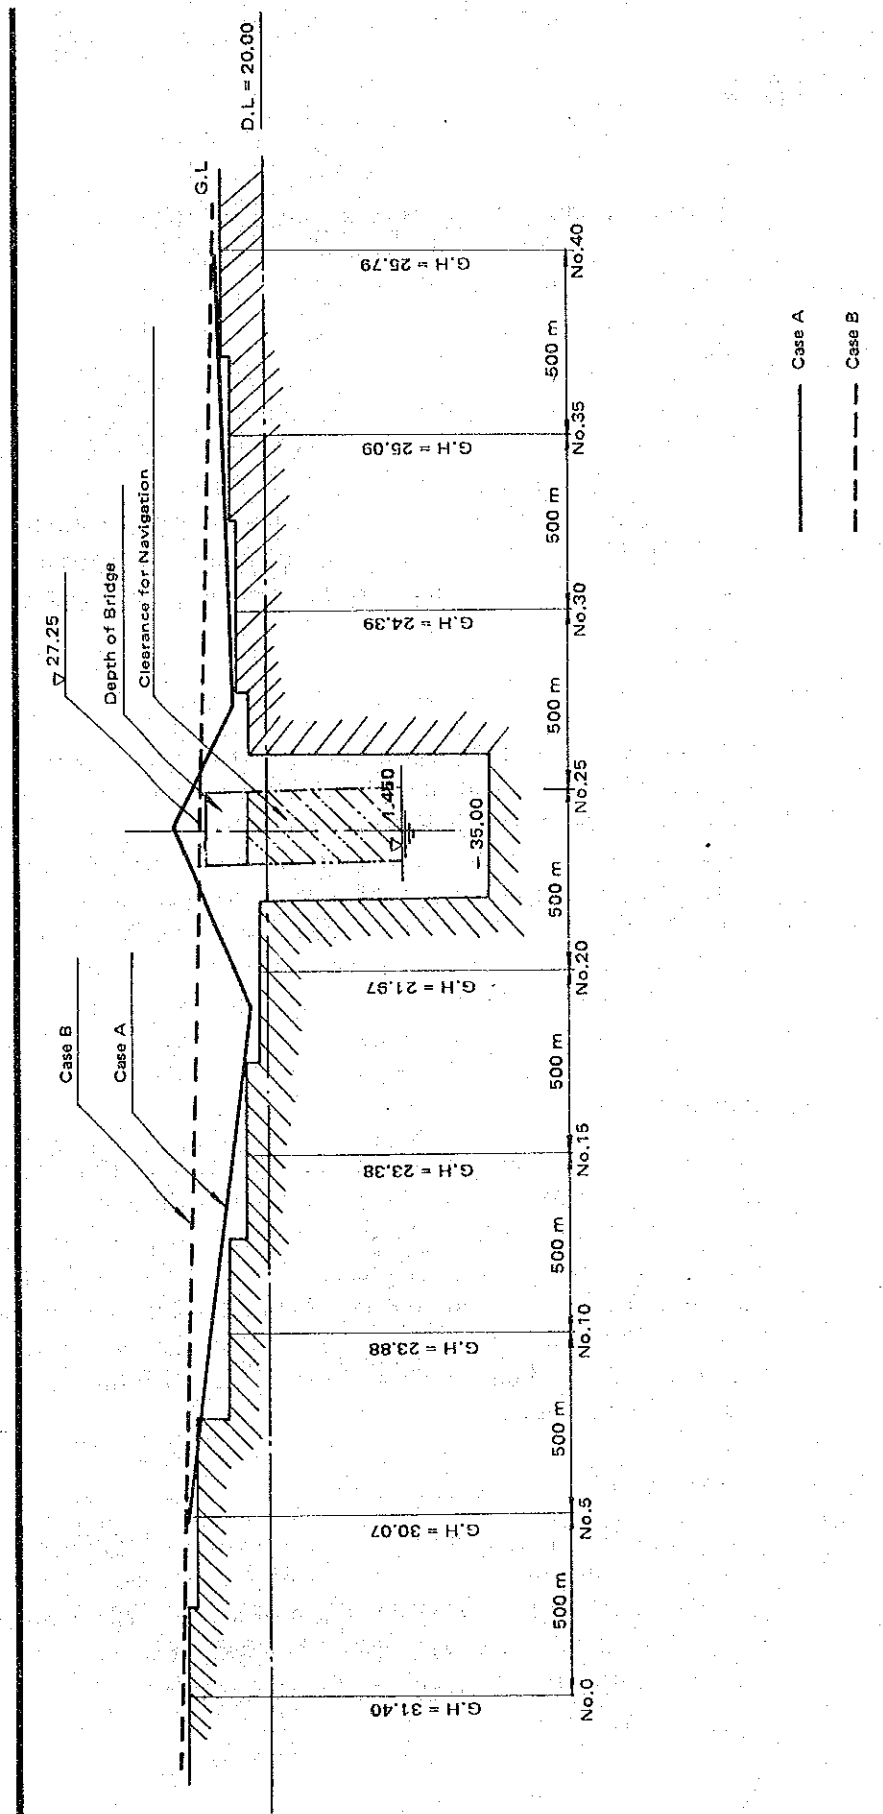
VERTICAL ALIGNMENT PLAN
